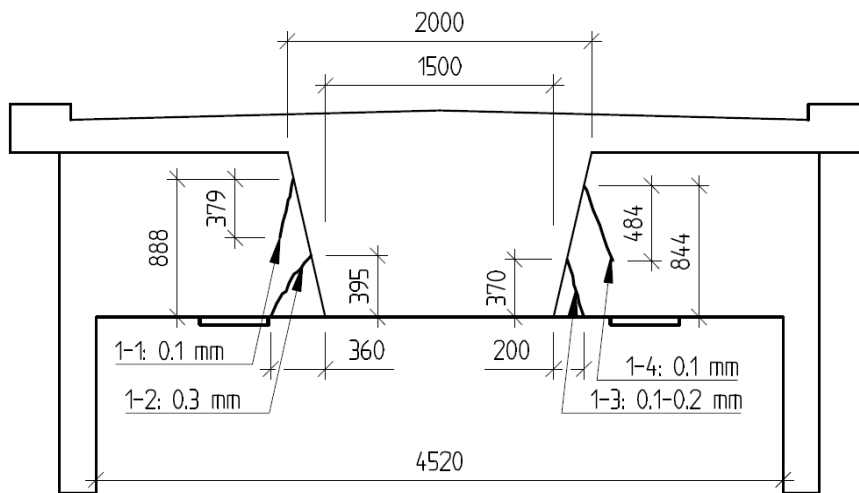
Crack mapping of bridge 13-799-1, support 1. Adapted from Batman (2010).
